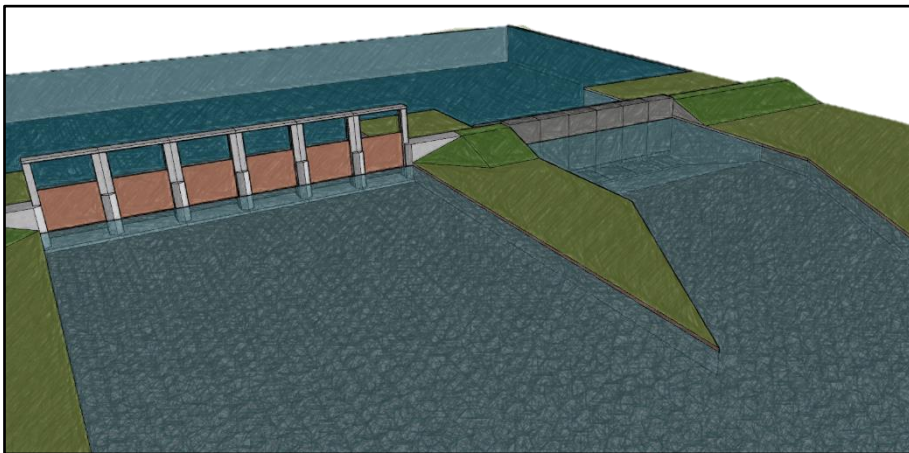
IMPRESSION DRAWING GATES + 6 PUMPS AT THE END OF A RIVER
